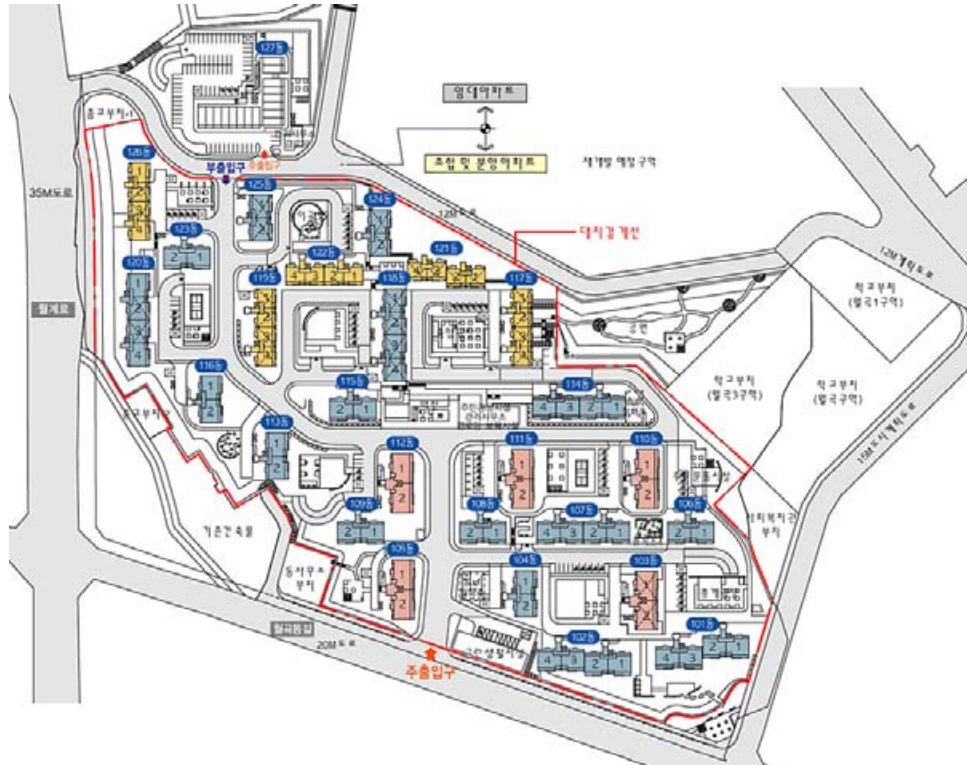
Site plan of Weolgok R apartment estate – 1 (www.raemian.co.kr)
